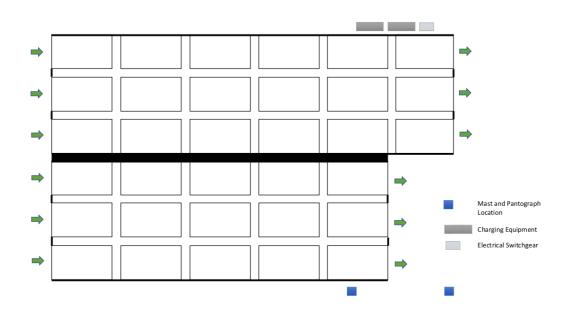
Kaspar Drive Building Schematic and Charging Equipment Location
